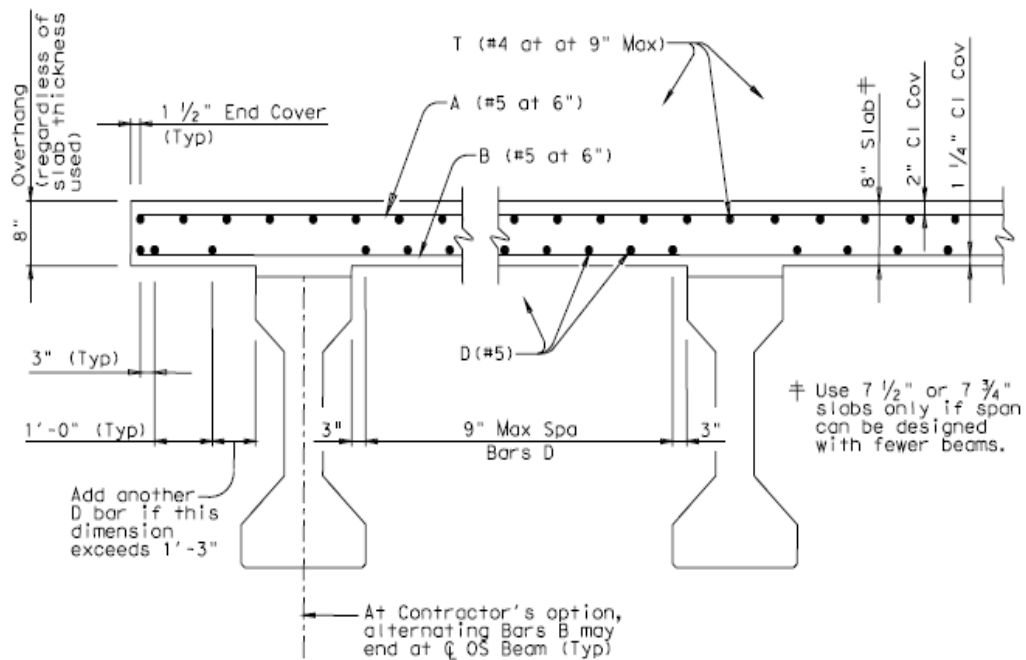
Texas DOT continuous bridge deck detail (from Simmons, 2001)
